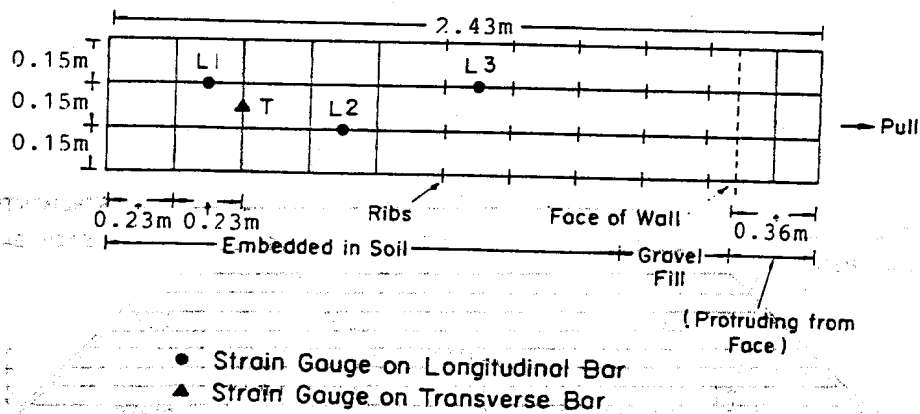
Typical schematic diagram of the dummy steel geogrid reinforcement used in the field pullout test.
